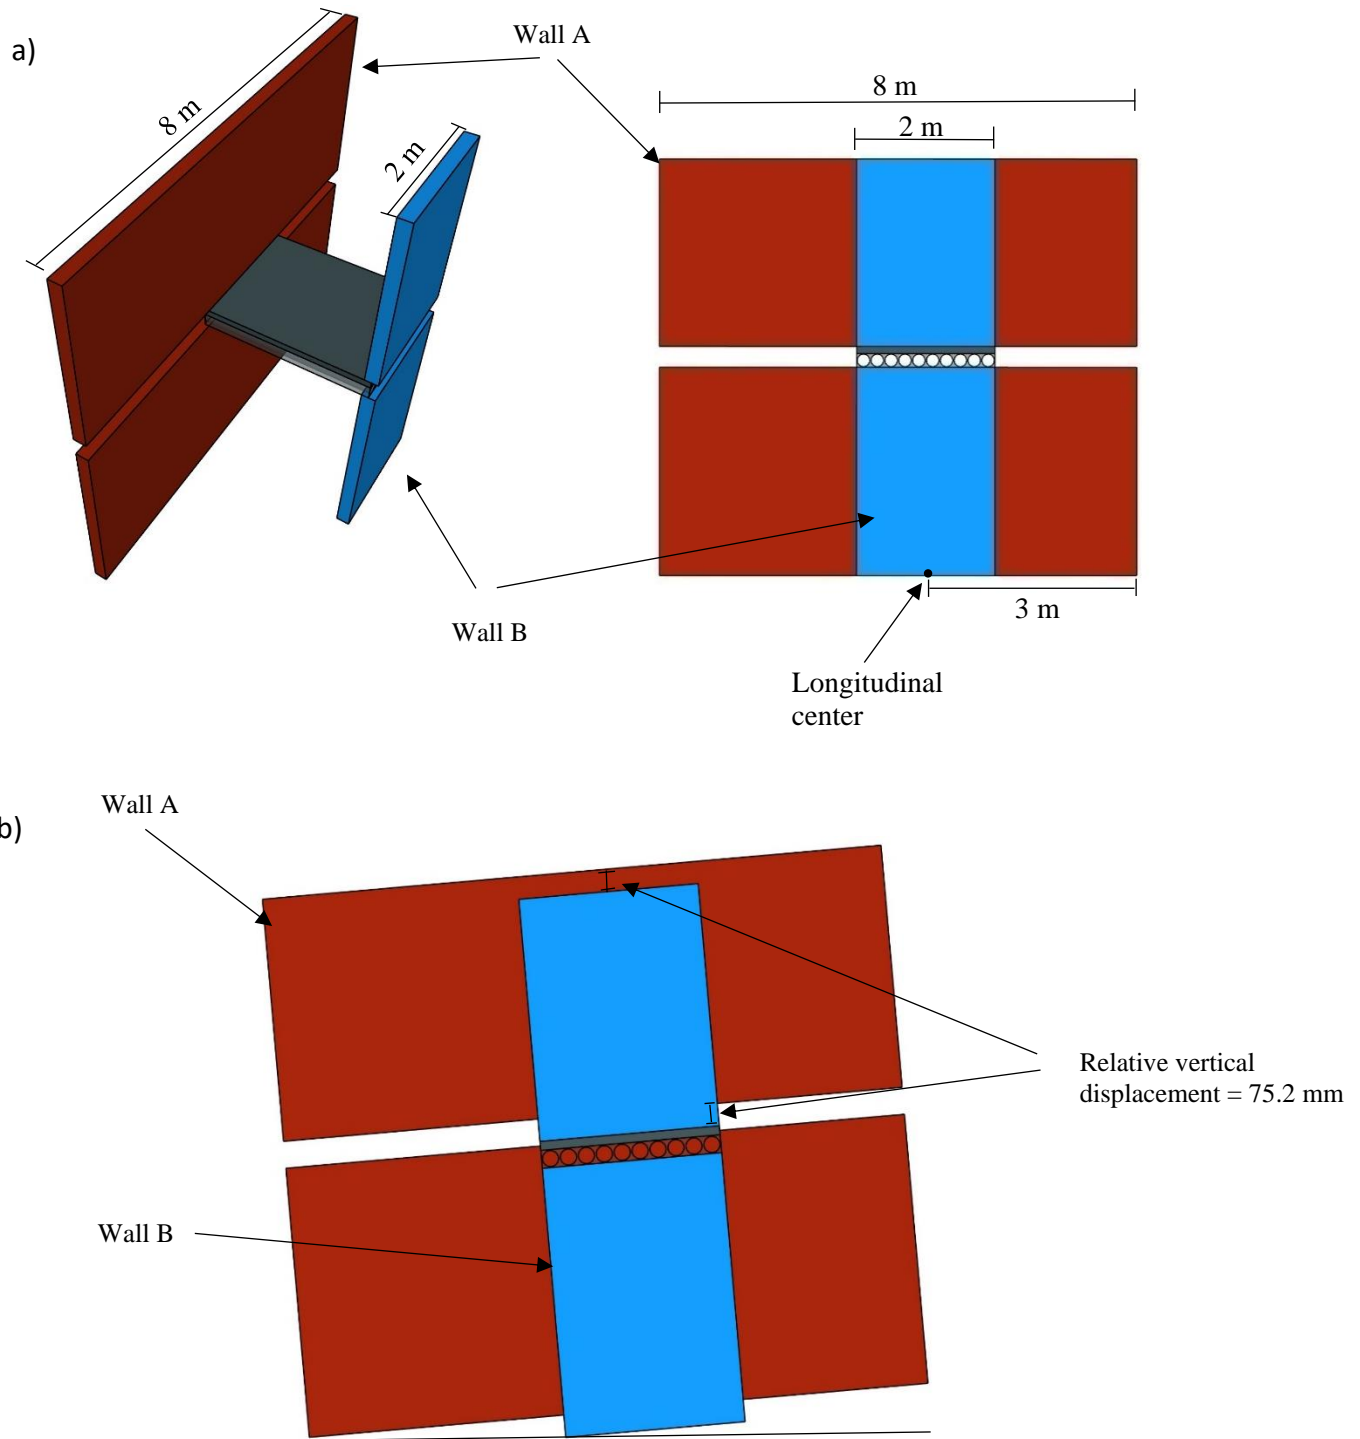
Example dimensions: a) Isometric and elevation view before rocking; b) Elevation view when rocking.
